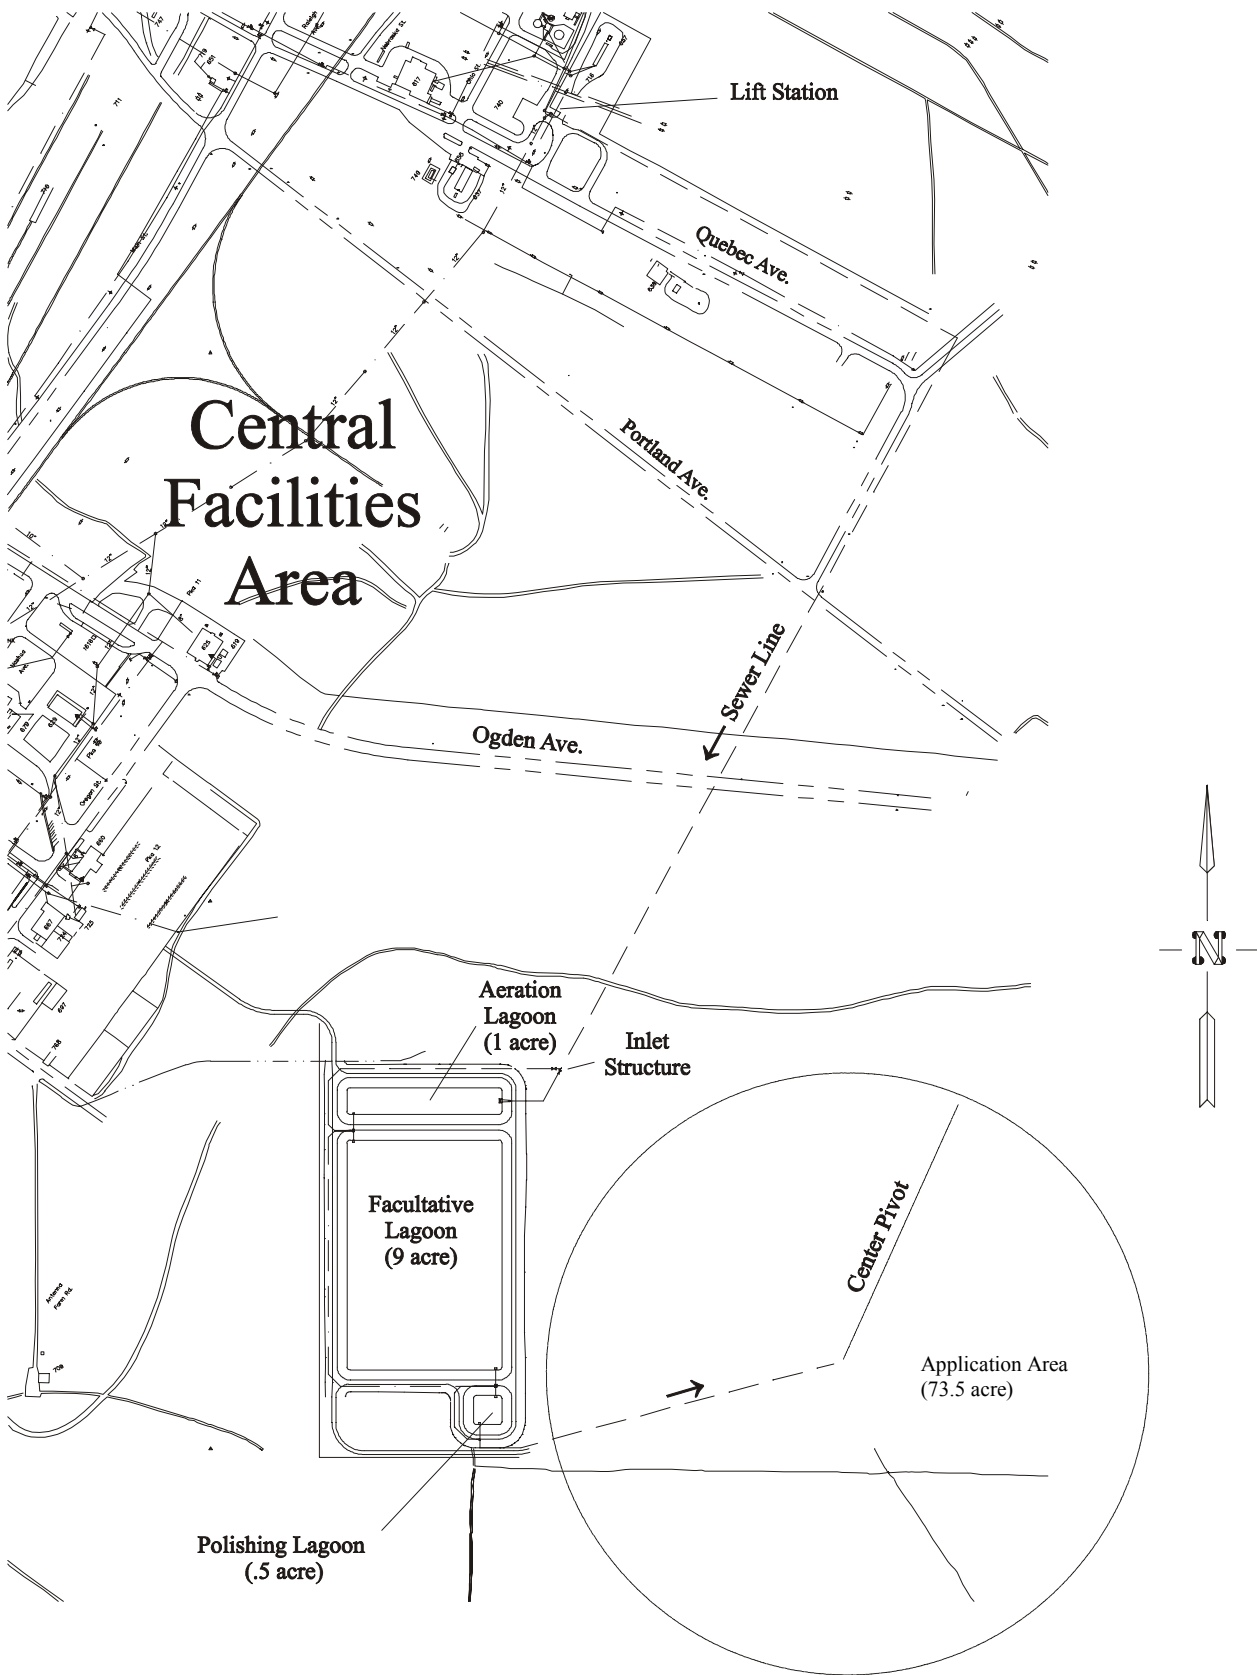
Central Facilities Area Sewage Treatment Plant.
